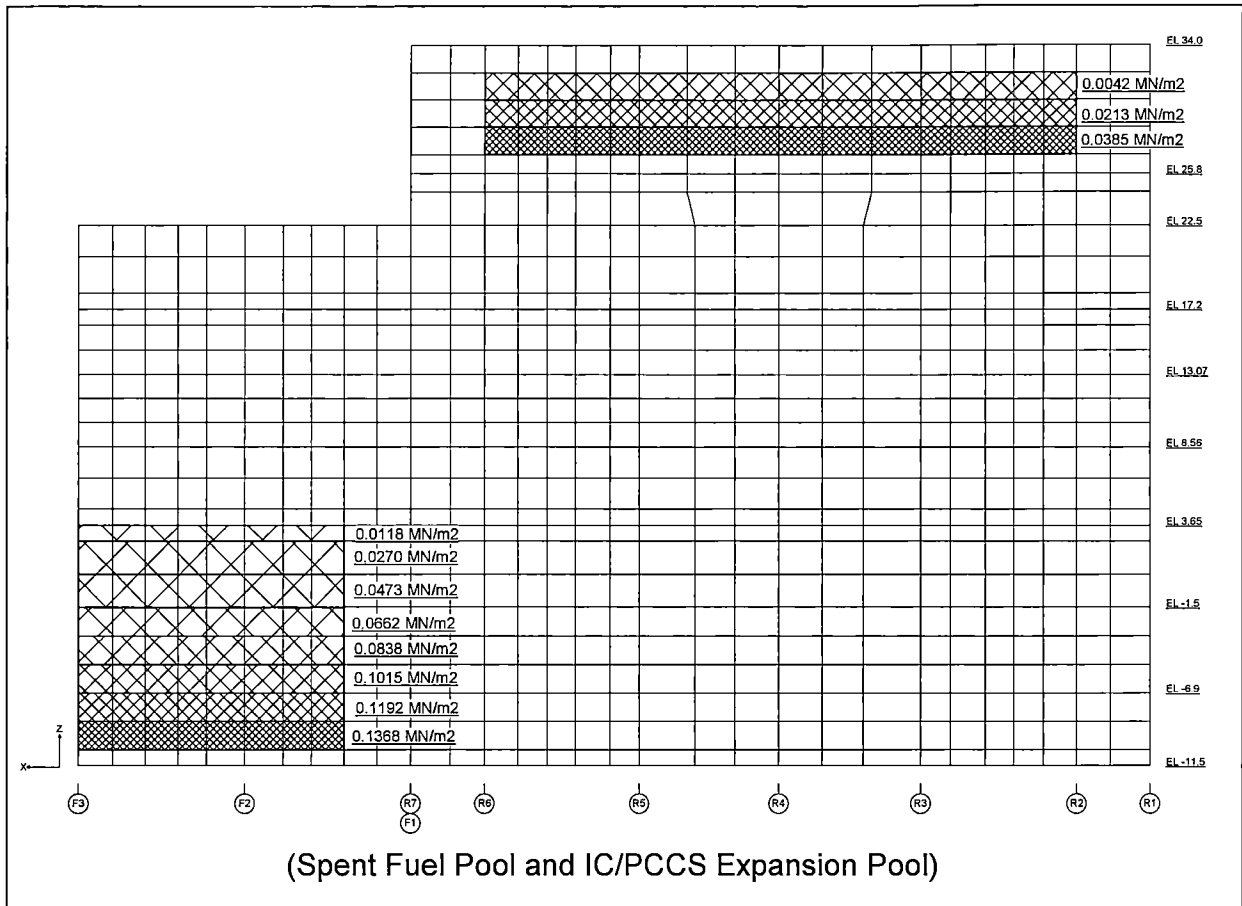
Hydrostatic Loads on the RA FA External Wall
